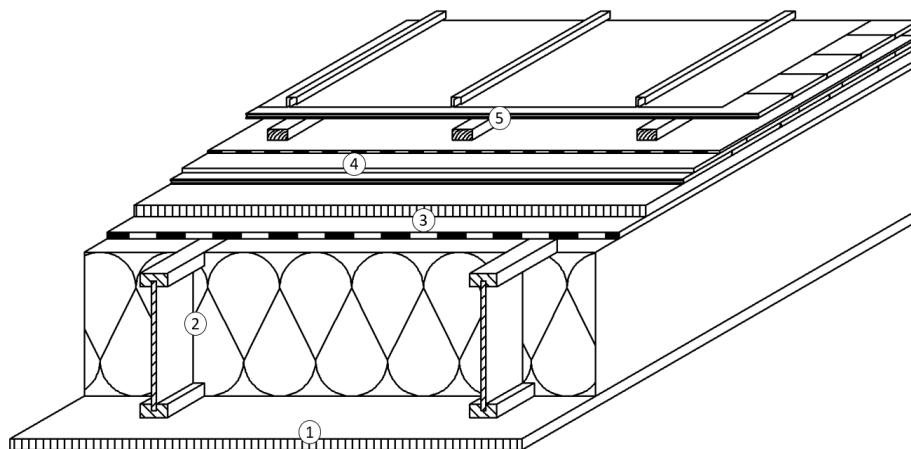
Layered structure of the roof variant 1 – 2 of the MFH/Office
